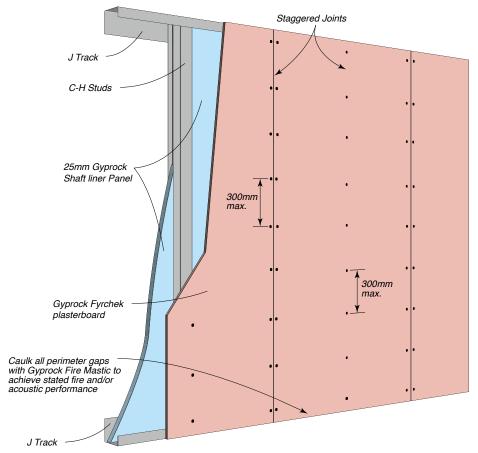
Fire Grade Plasterboard Fixing to Shaftwall - One Layer Horizontal Sheeting - Non-Tiled Areas
